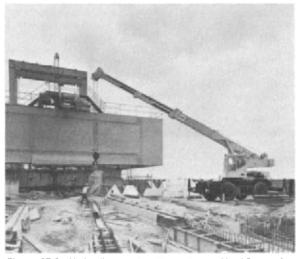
Hydraulic crane handling roll-over skip. (*Courtesy*): Coles Cranes Ltd)
